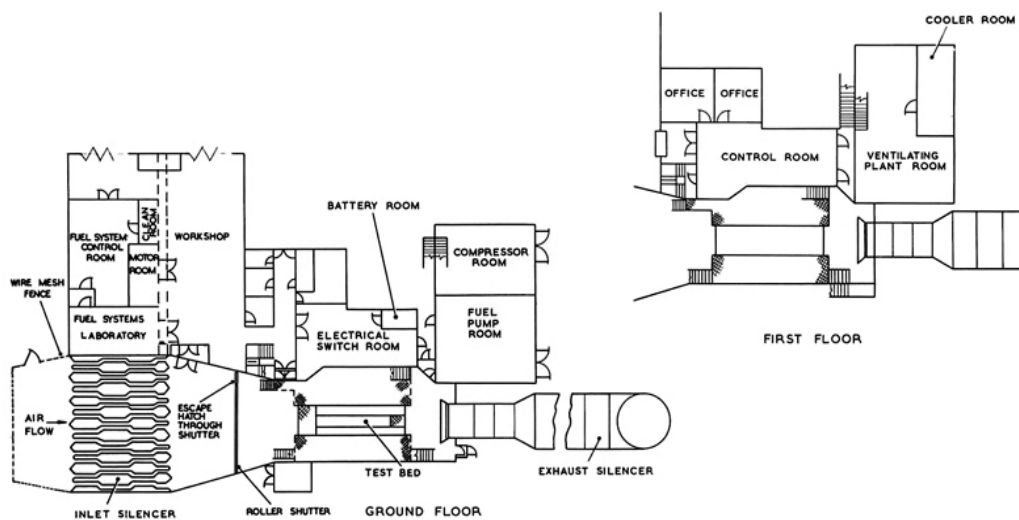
Plan layout of indoor test facility, the 'Glen' test house (www.ngte.co.uk)
